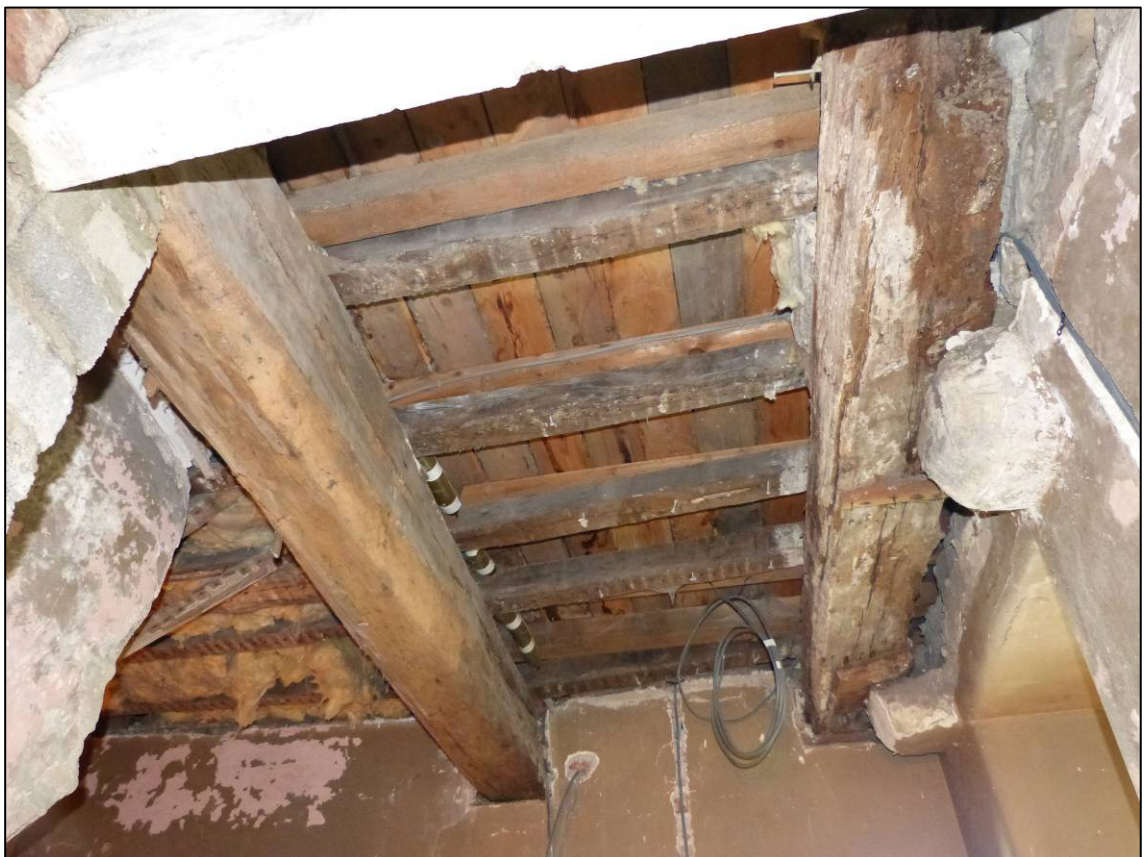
Chapel lower ground floor, west end, beams over former vestry, looking W (photo 5/882).
